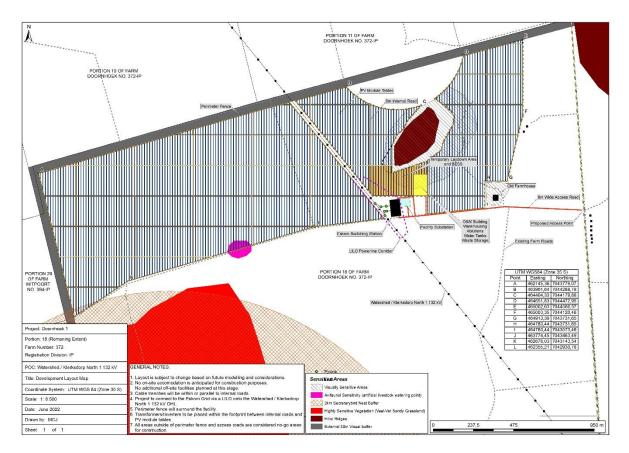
Preferred layout (Layout Alternative 1) for Doornhoek 1 PV.
